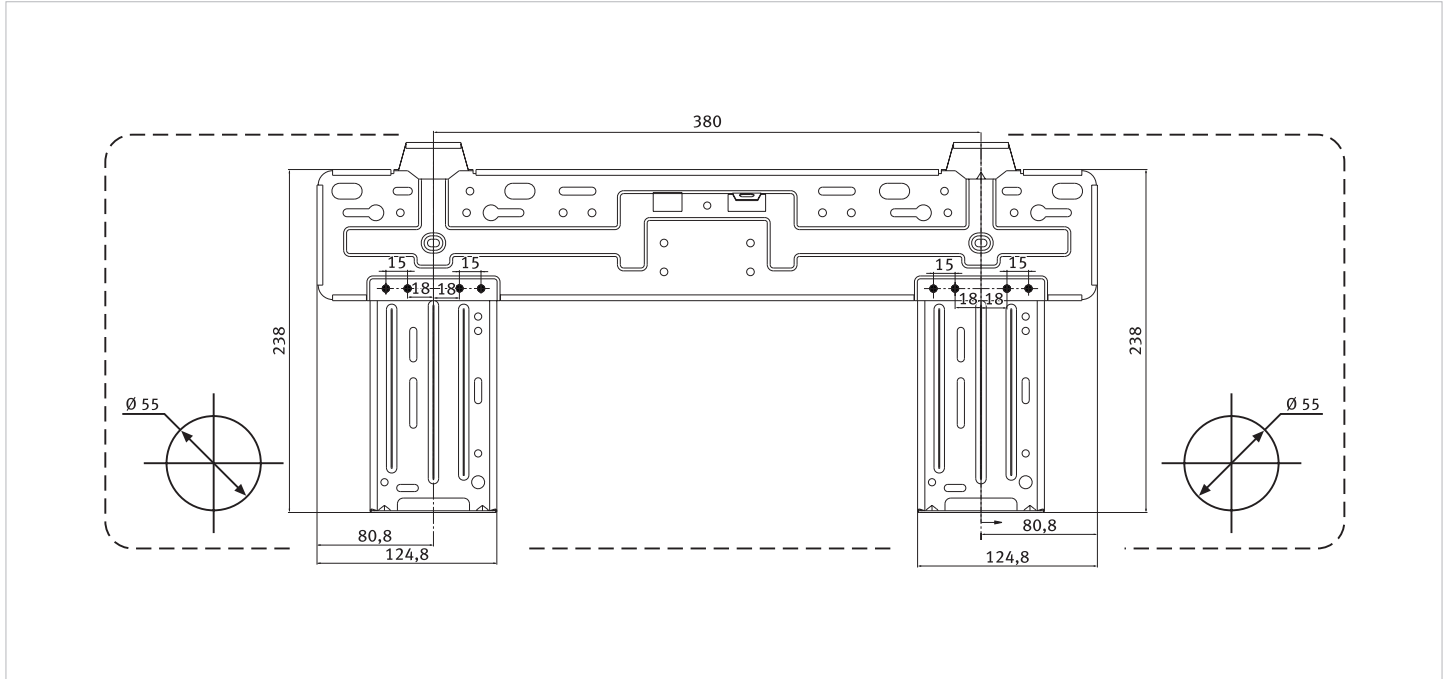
Mounting plate for 18-025 NWI and 18-035 NWI.
